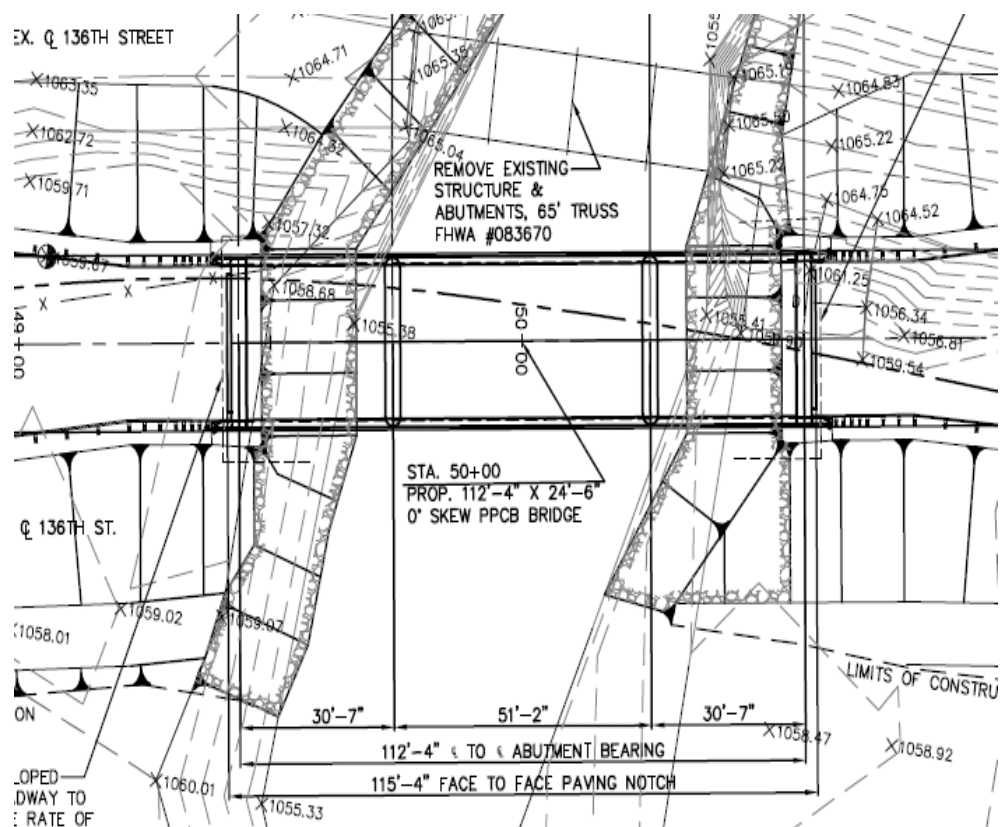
Situation plan of Buchanan County Pi Girder Bridge
